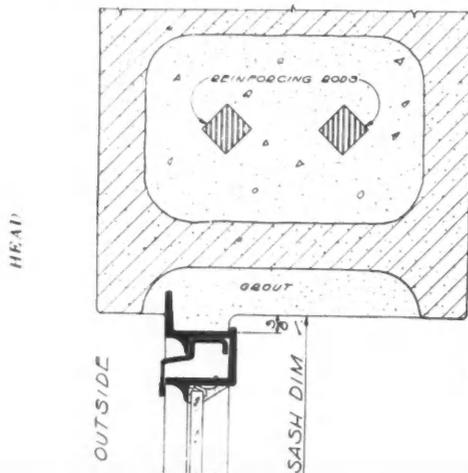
Detail of Window Head Construction, Concrete Blocks and Steel Sash.
